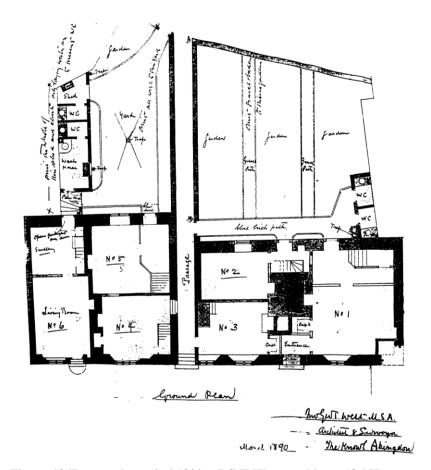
'Proposed repairs' 1890 – J G T West, architect (OAU)
